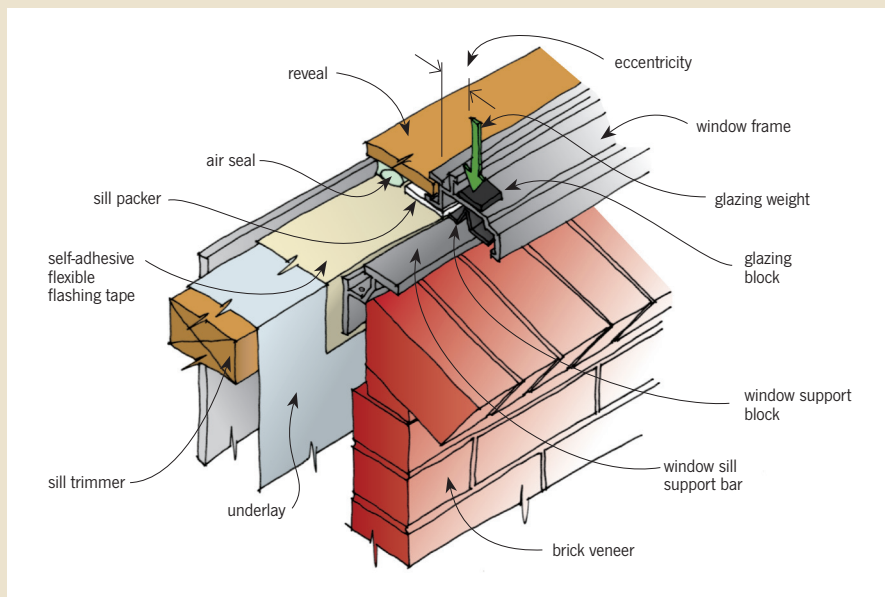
Cross-sectional elevation of a window in a brick veneer wall.
